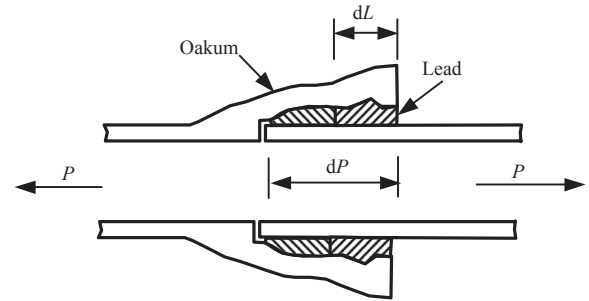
Schematic drawing of bell-and-spigot lead caulked joint.
